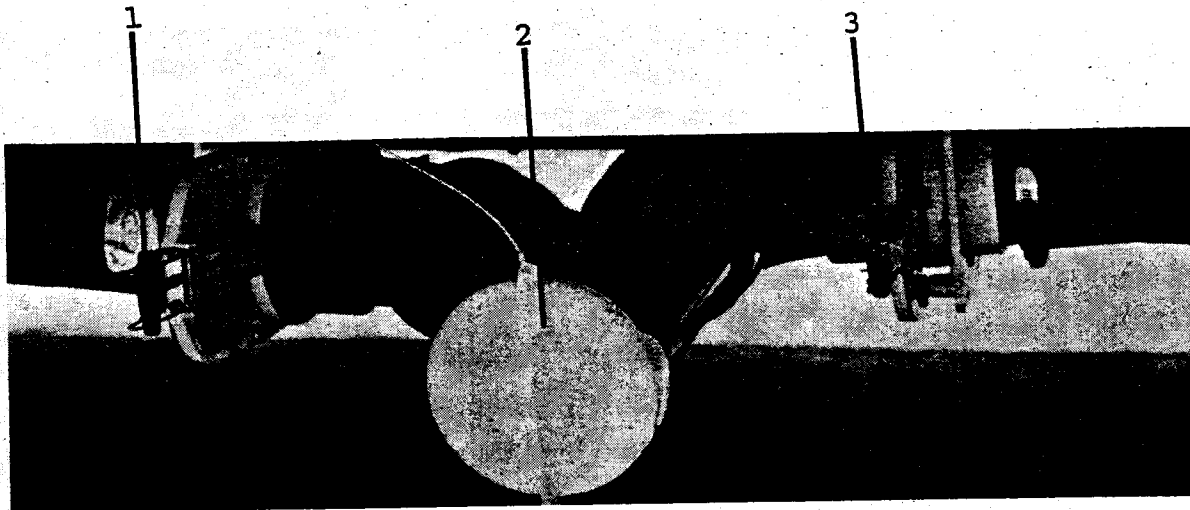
Typical Side Bath Holding Tank Drain Installation
